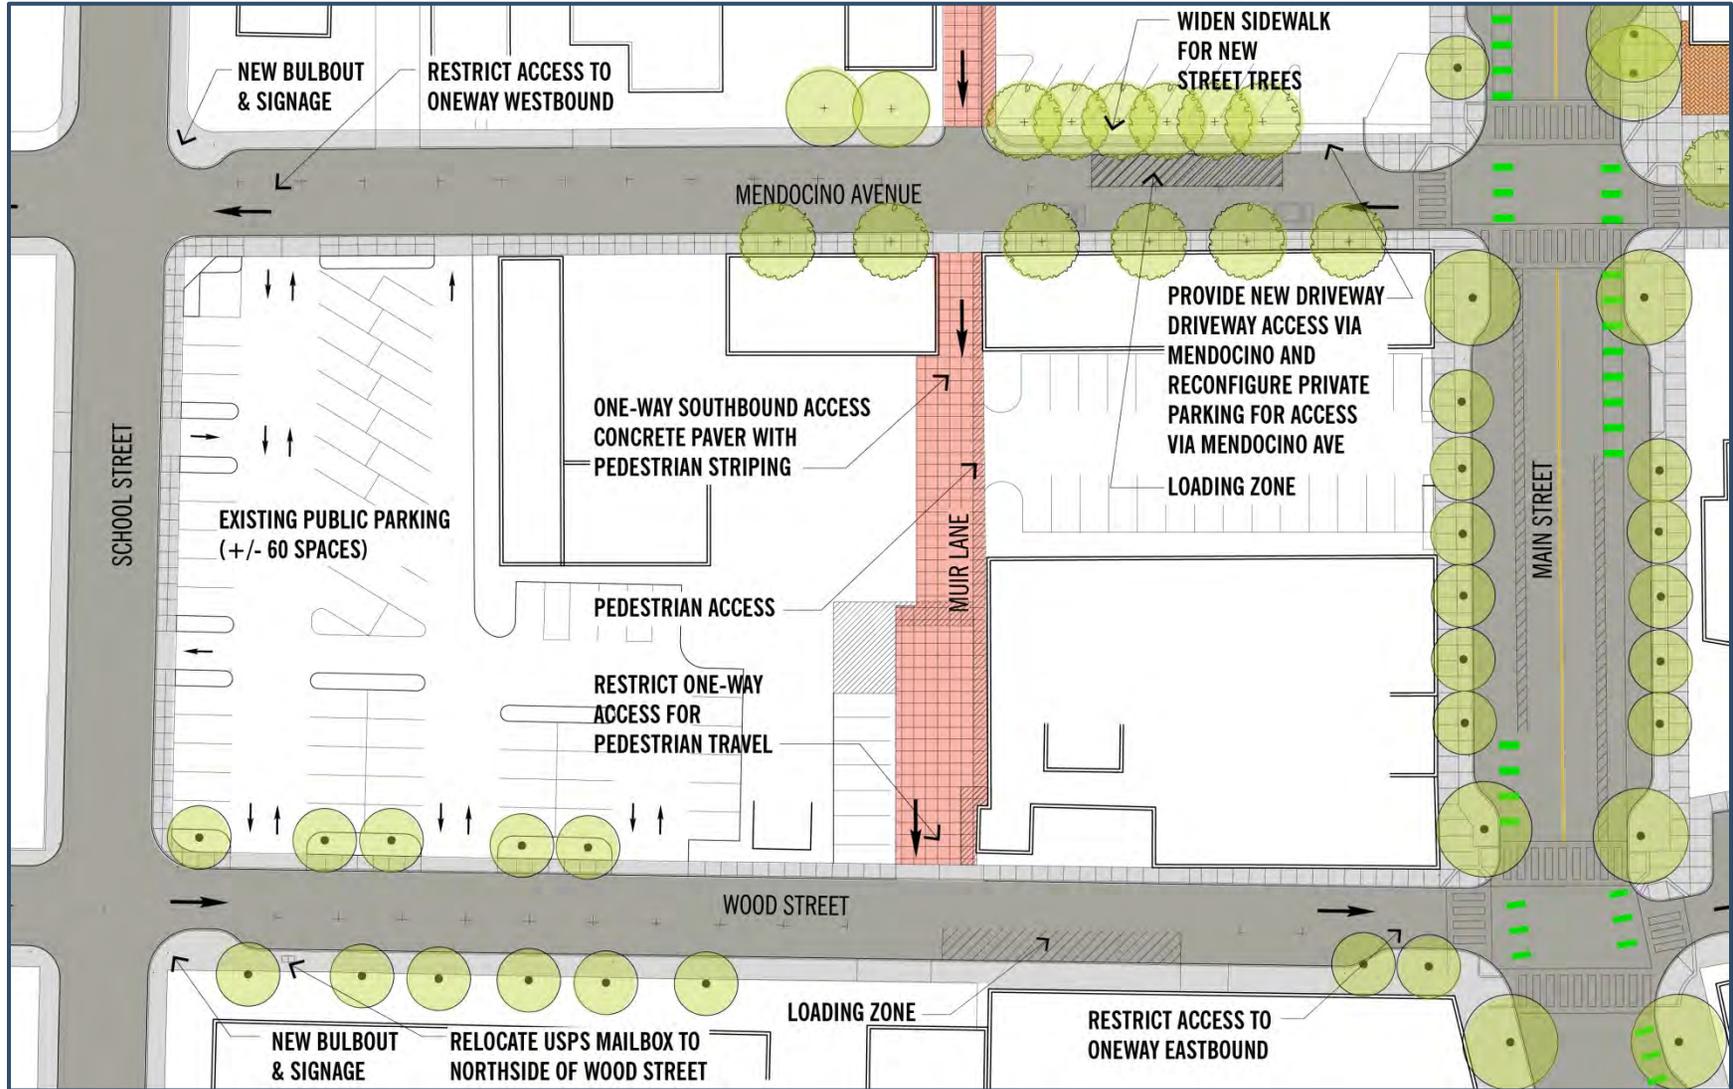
Mendocino Avenue and Wood Street/Alley Illustrative Plan
